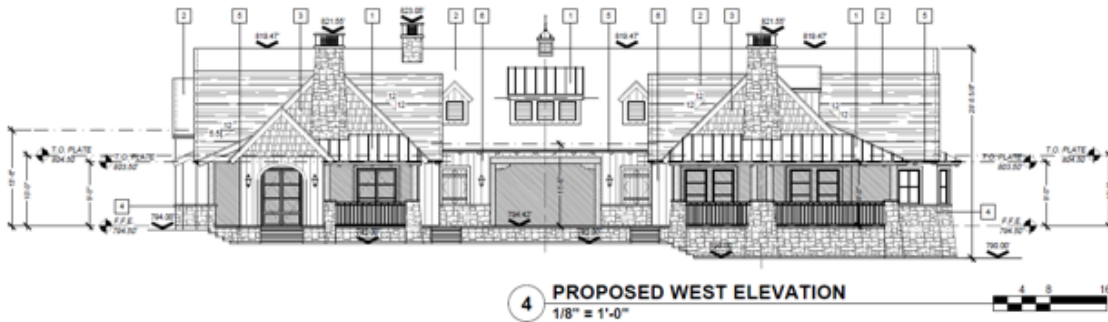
PROPOSED PRIMARY RESIDENCE ELEVATION
